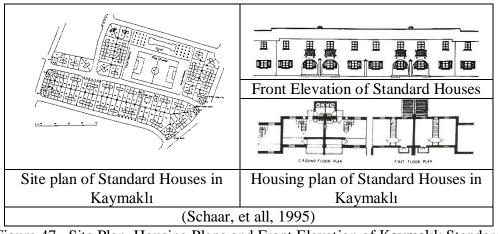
Site Plan, Housing Plans and Front Elevation of Kaymaklı Standard Houses
